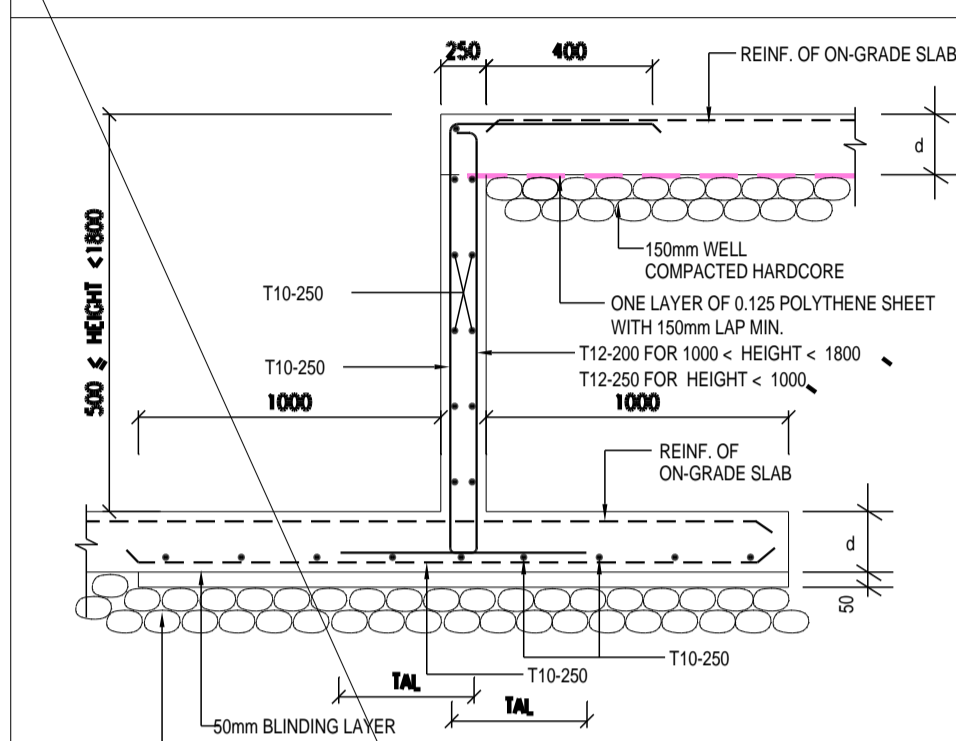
DETAIL FOR DIFFERENT LEVEL OF ON-GRADE SLAB
